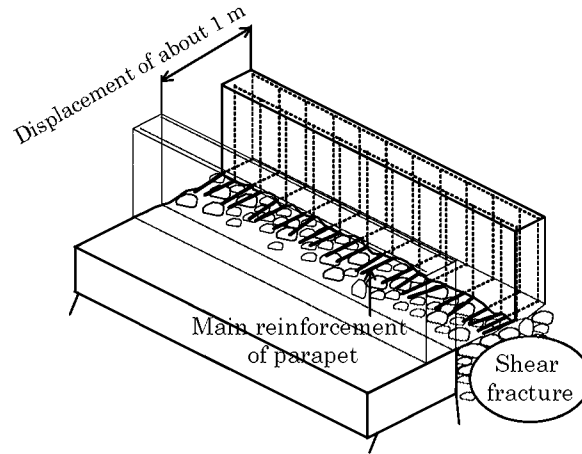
Damage to the abutment of the Chang-Geng Bridge in the Chi-Chi Earthquake, Taiwan
